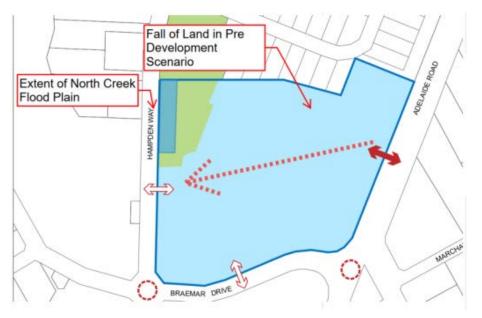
Site Layout (Source: Tonkin Consulting)
